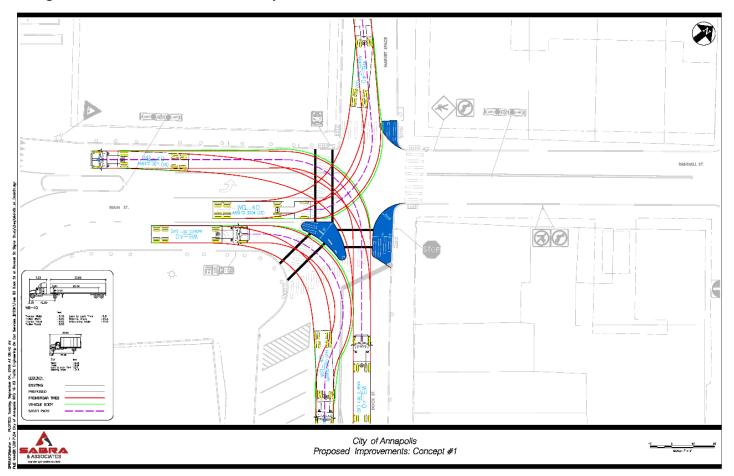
Alternative 2 Concept for Randall Street and Dock Street
